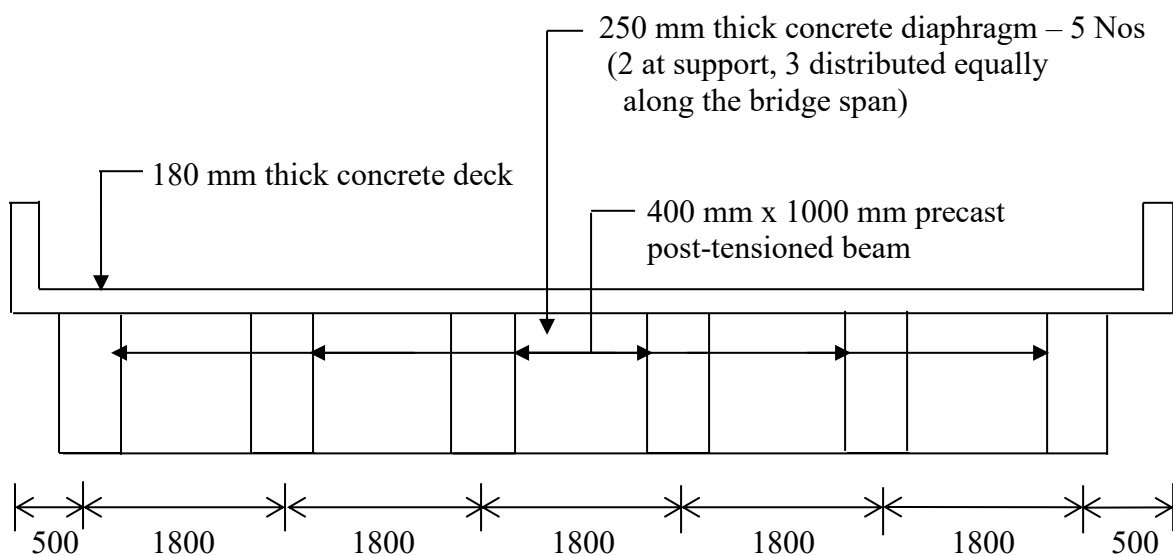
Cross section of a bridge at midspan (all dimensions in mm)
